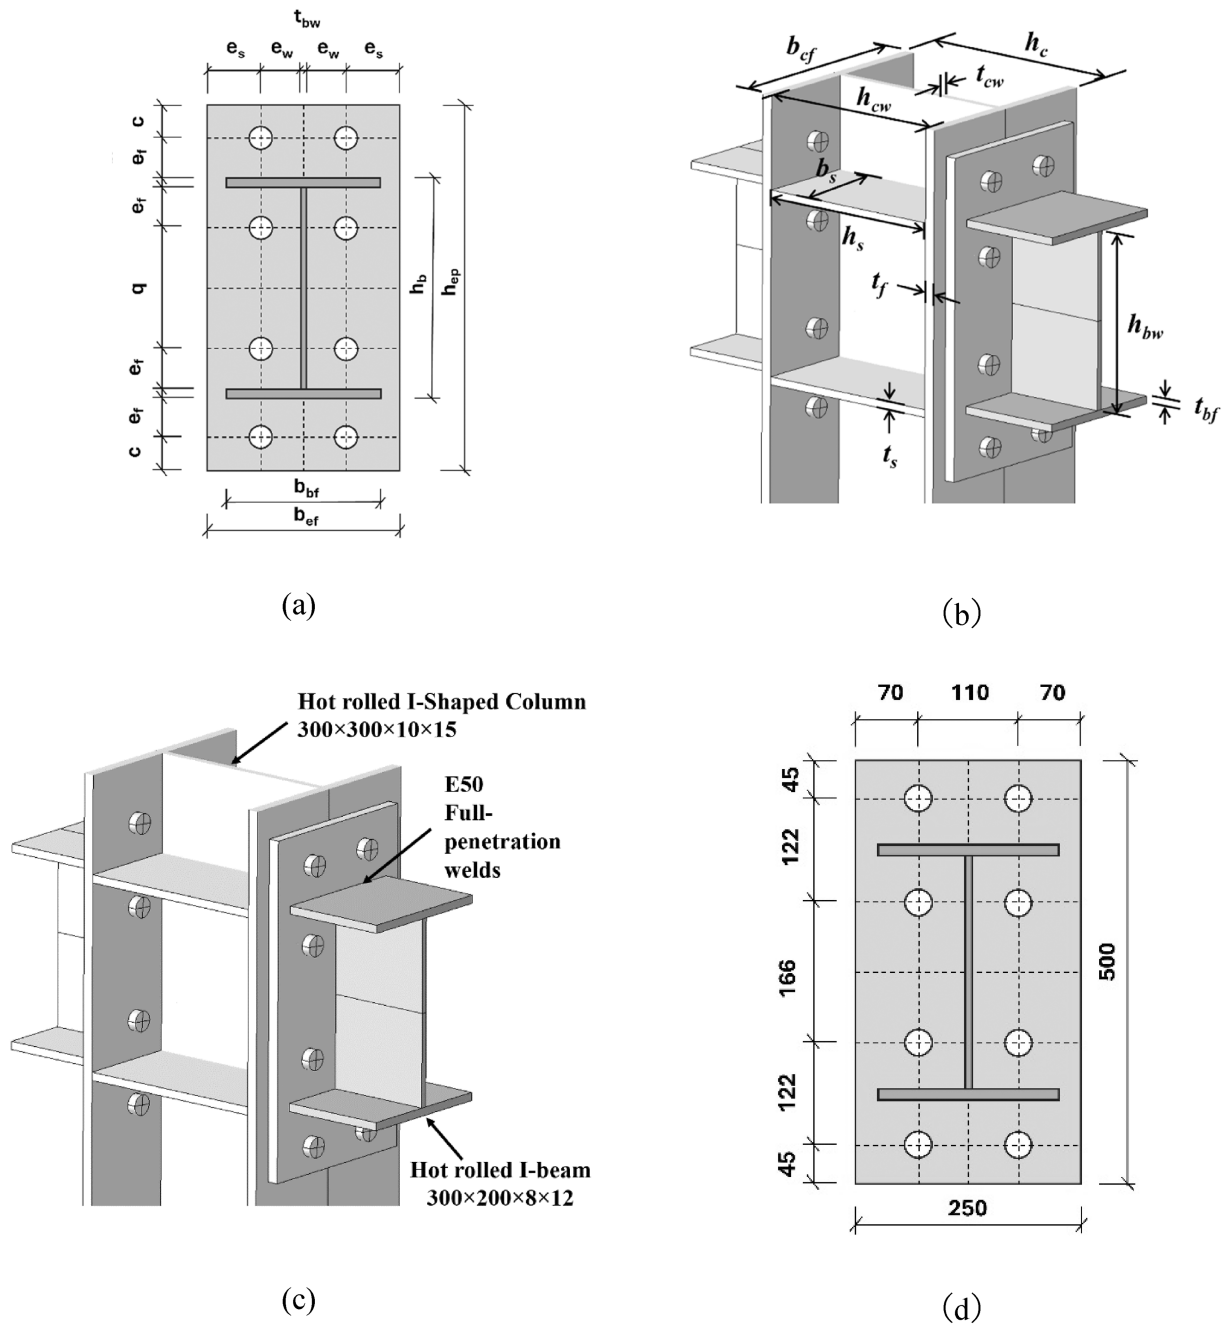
| Design details: (a) End-plate connection parameters, (b) Joint parameters, (c) Sectional detailing of the beam and column, and (d) End plate joint specifications (mm).
